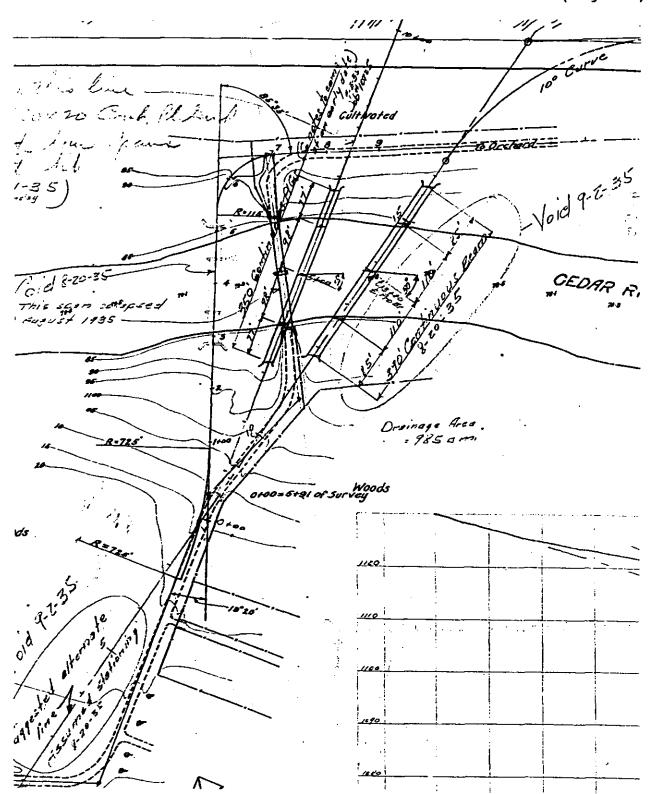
From design plan: Plan and Profile, showing placement of the three proposed bridge alternates.
